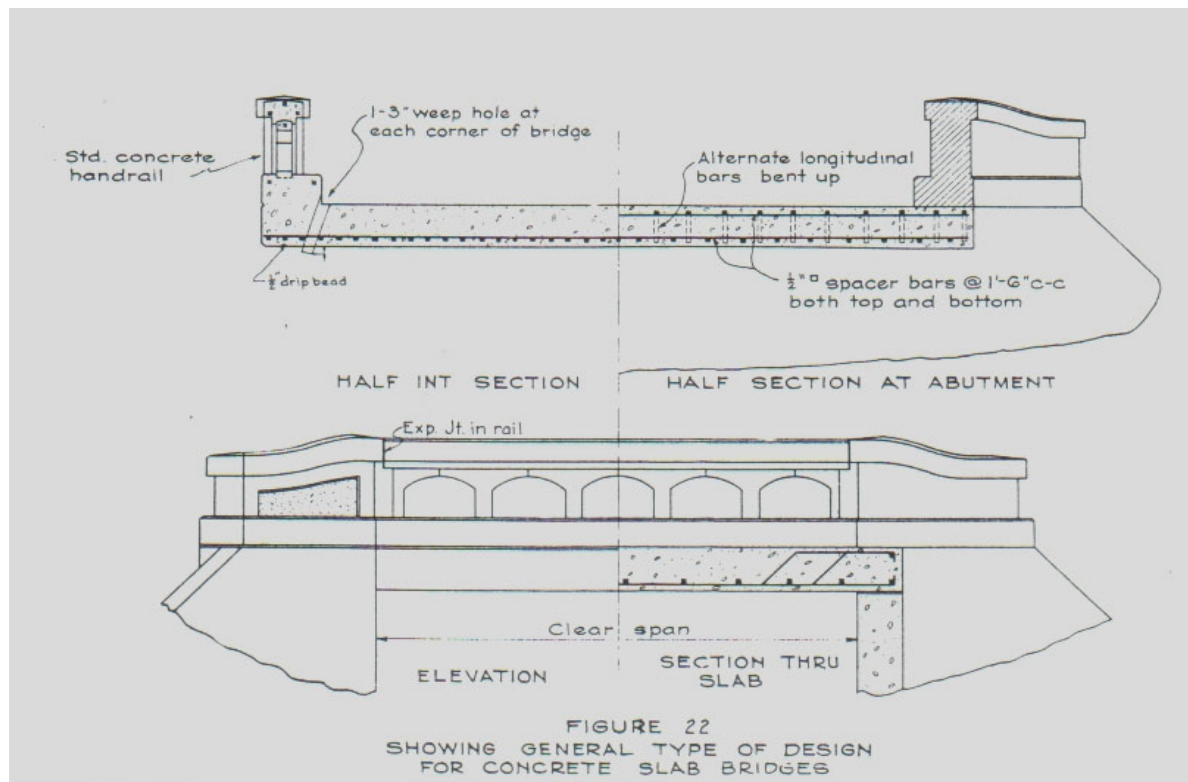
Typical Slab Bridge Design, Oregon Examples, 1929
